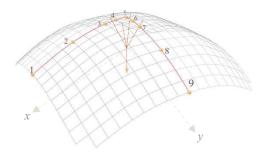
Arrangement of measurement joints and loading points on the bamboo-timber gridshell.
